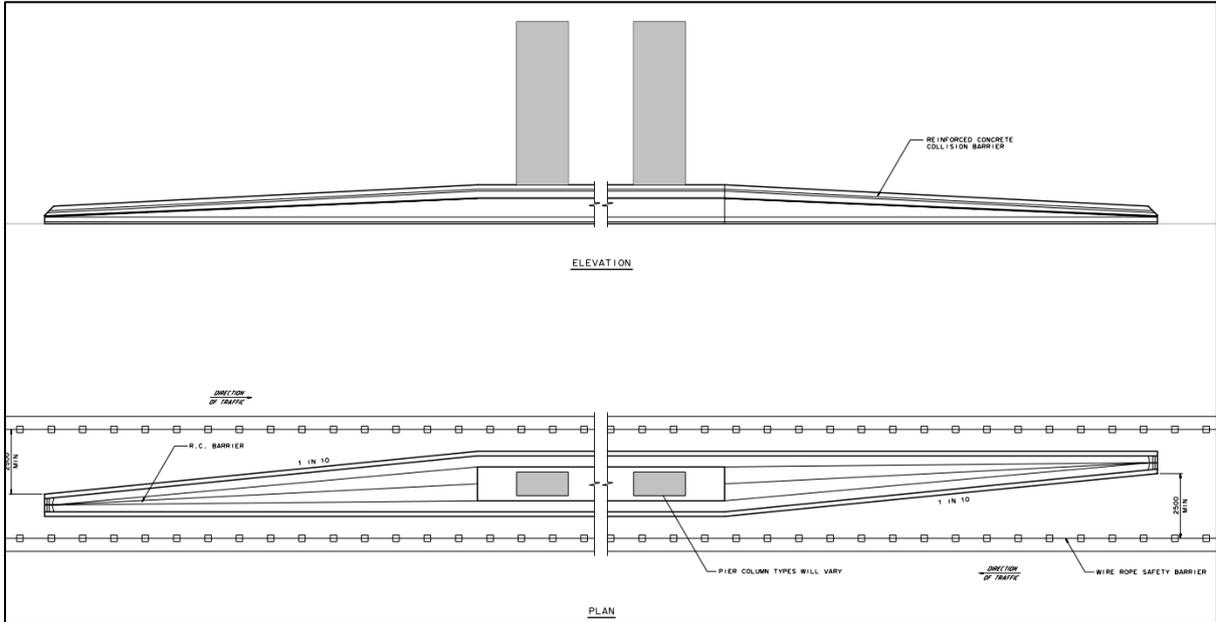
Typical Pier Protection Barrier (ref BTN 003)
